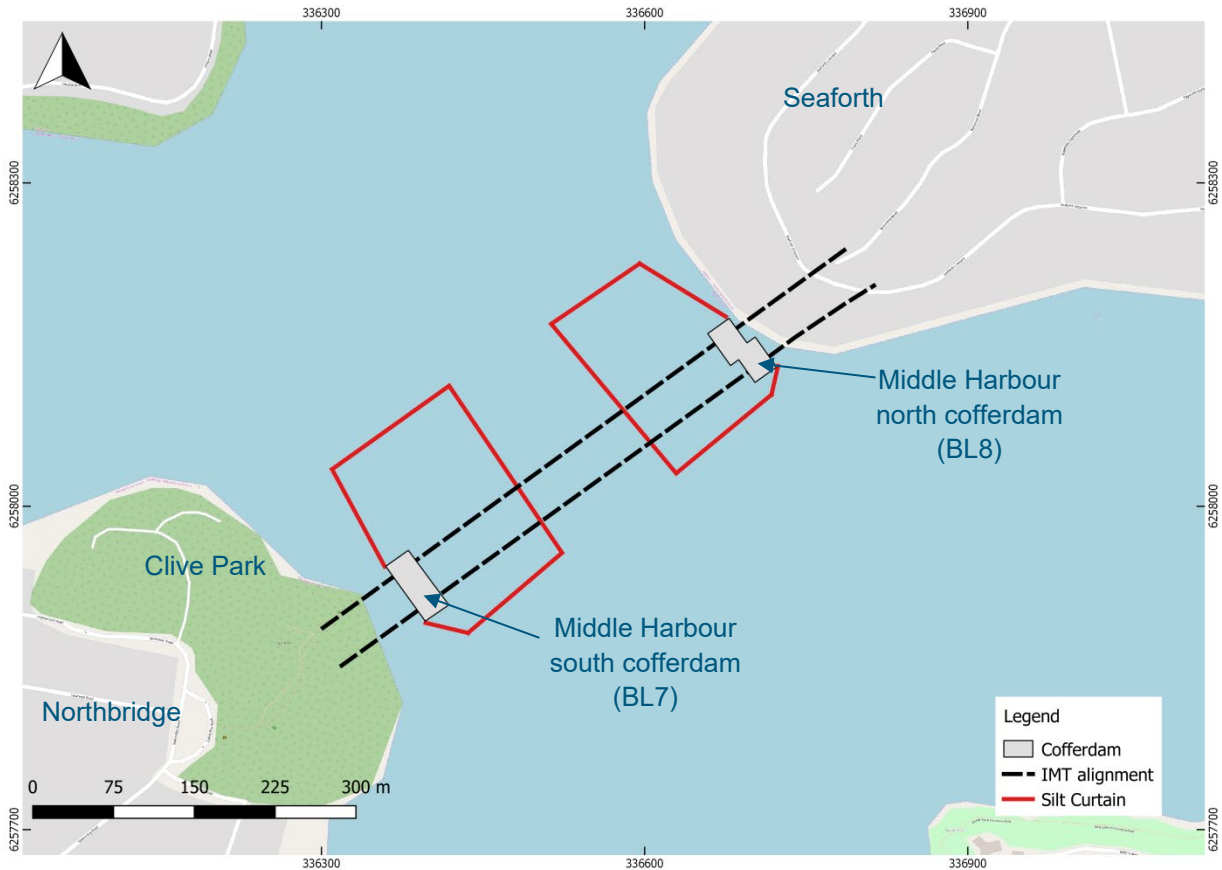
Cofferdams and deep draft silt curtains layout during construction at the project crossing
